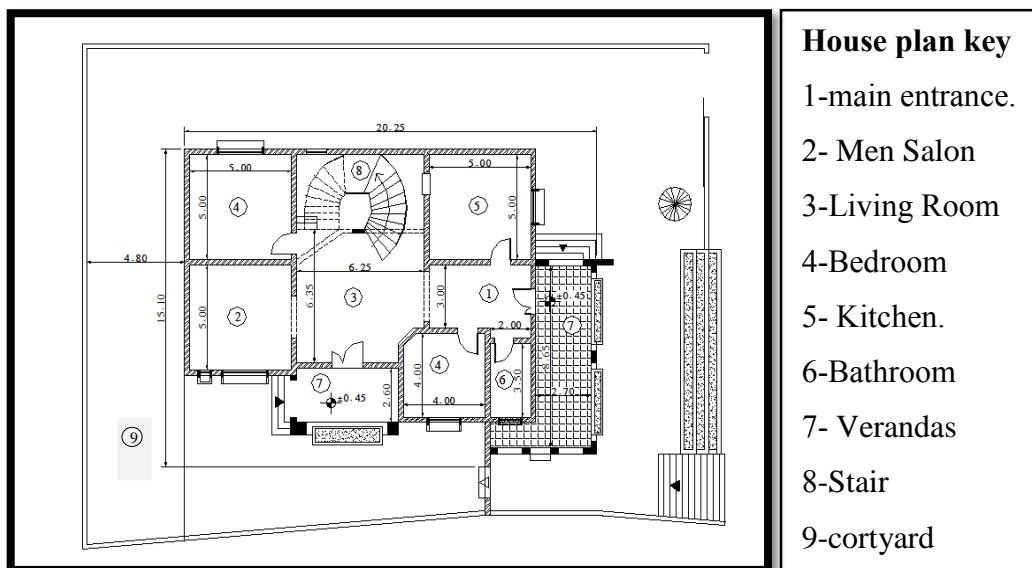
Plan of Arabi Belhadj House in Gharyan (photo by author)
